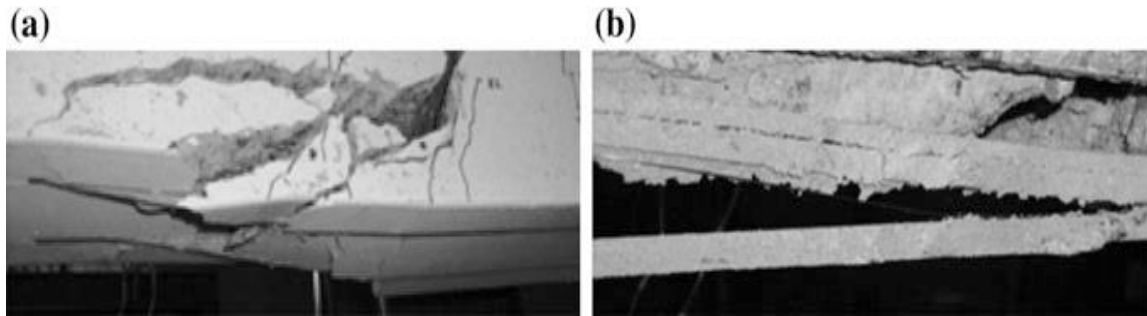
Failure by concrete cover separation: (a) Followed by flexural shear failure crack propagation, (b) Fracture along the NSM strip [94].
